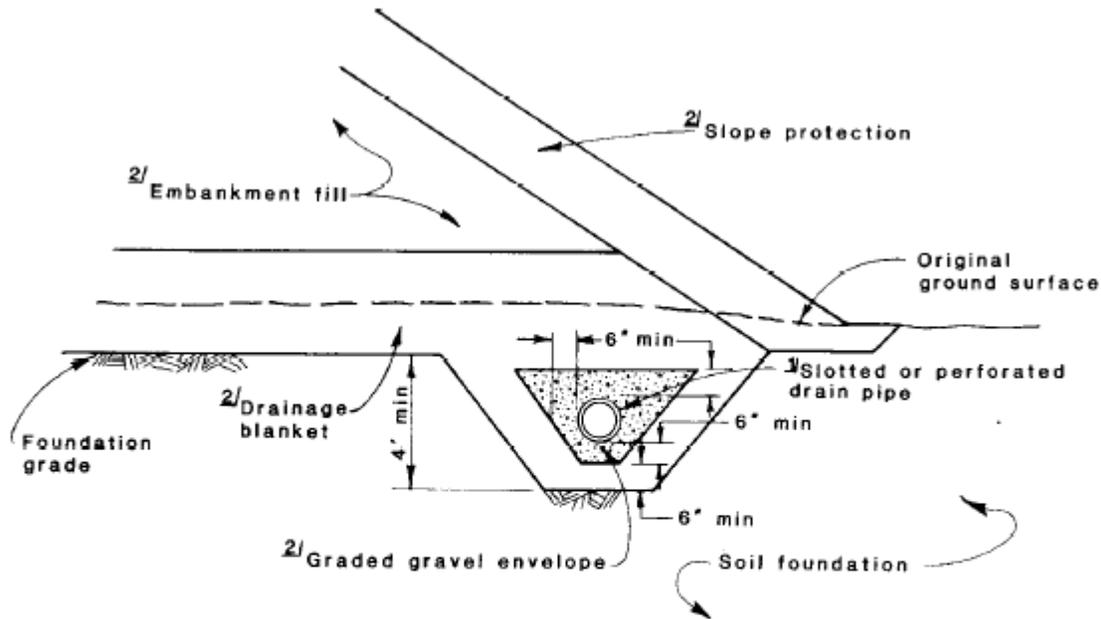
Downstream embankment sections for pervious foundations. 288-D-2483.
